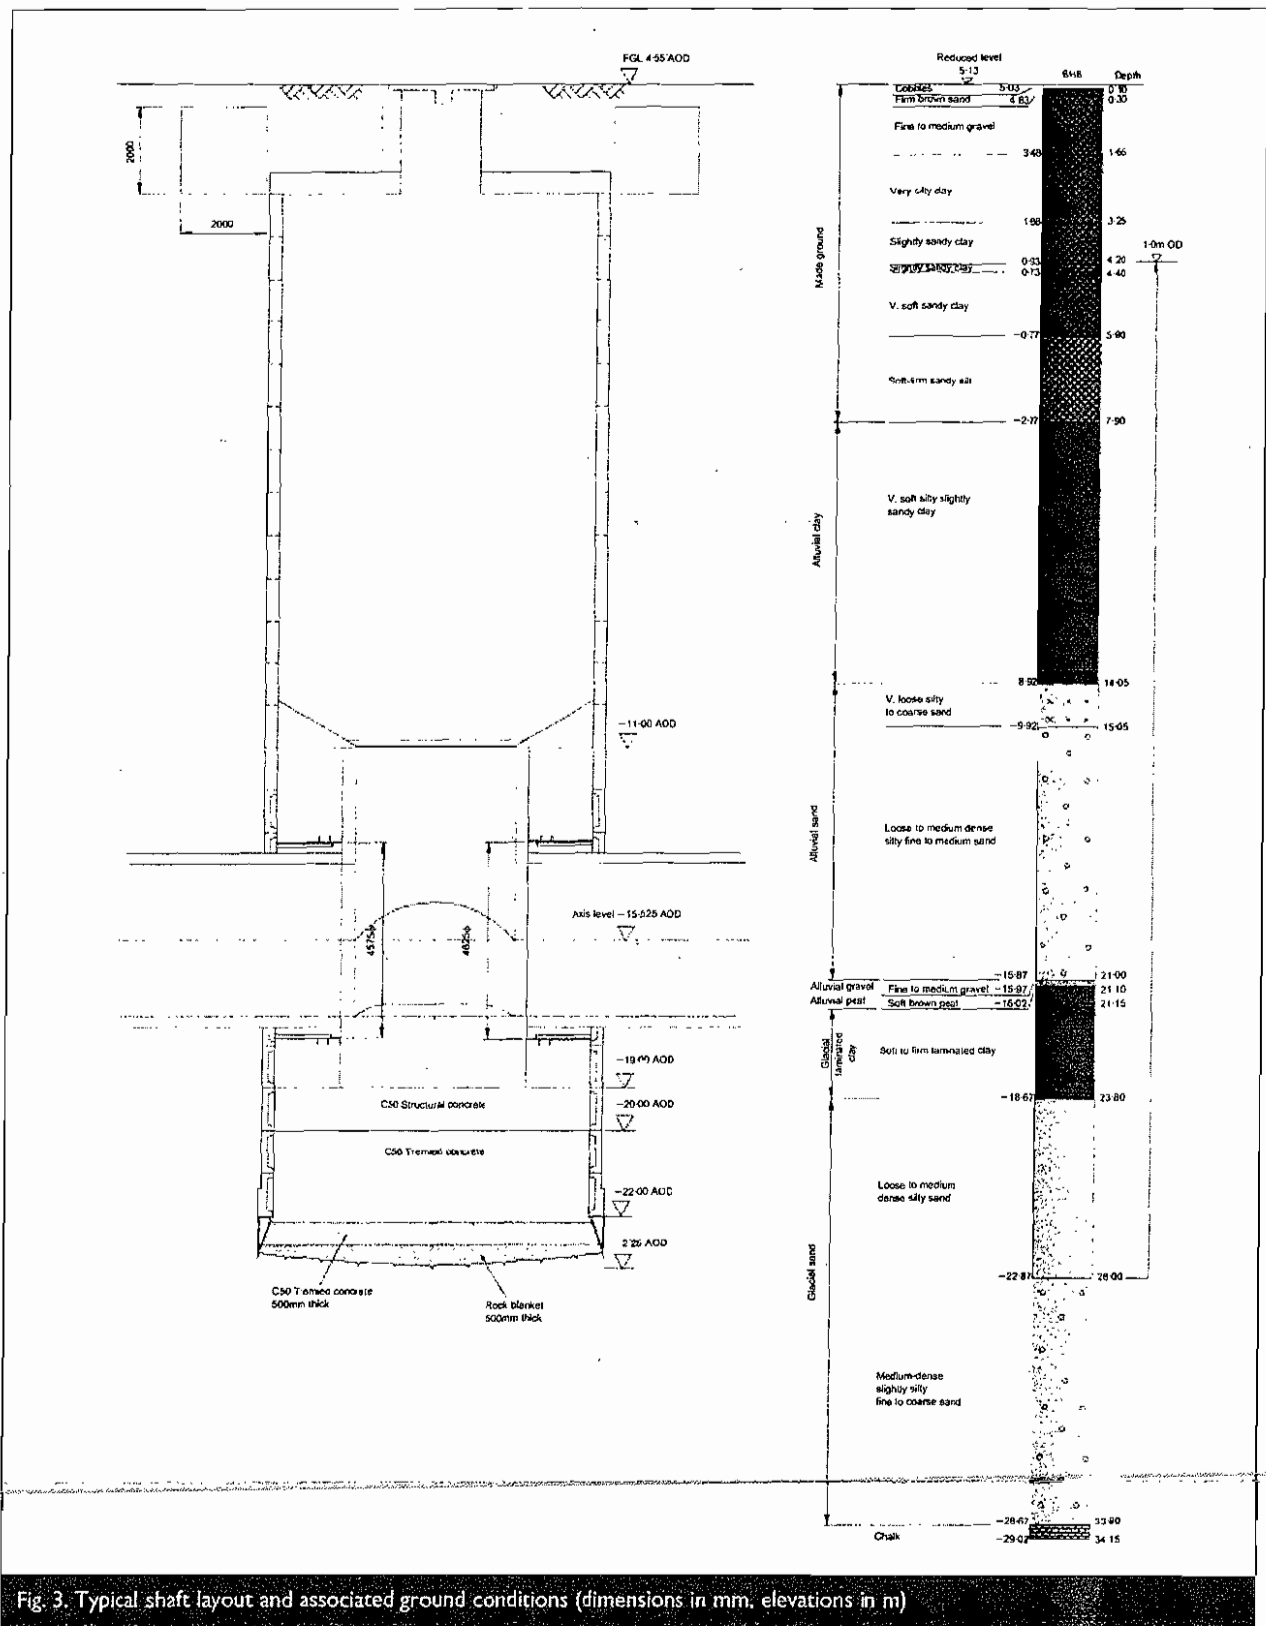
Typical shaft layout and associated ground conditions (dimensions in mm, elevations in m)
